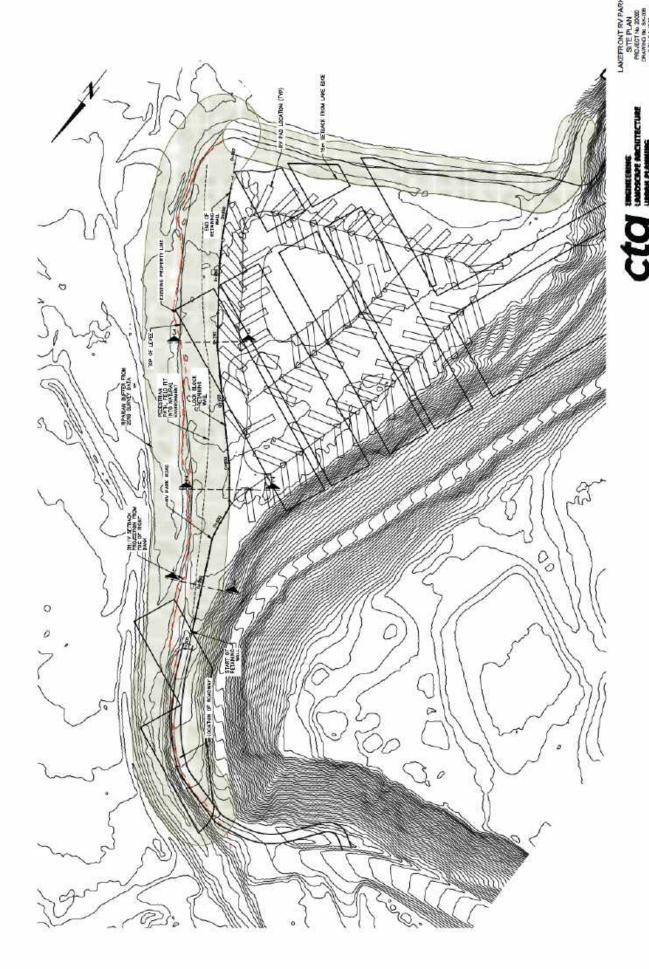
CTQ Proposed Flood Mitigation Site Plan
